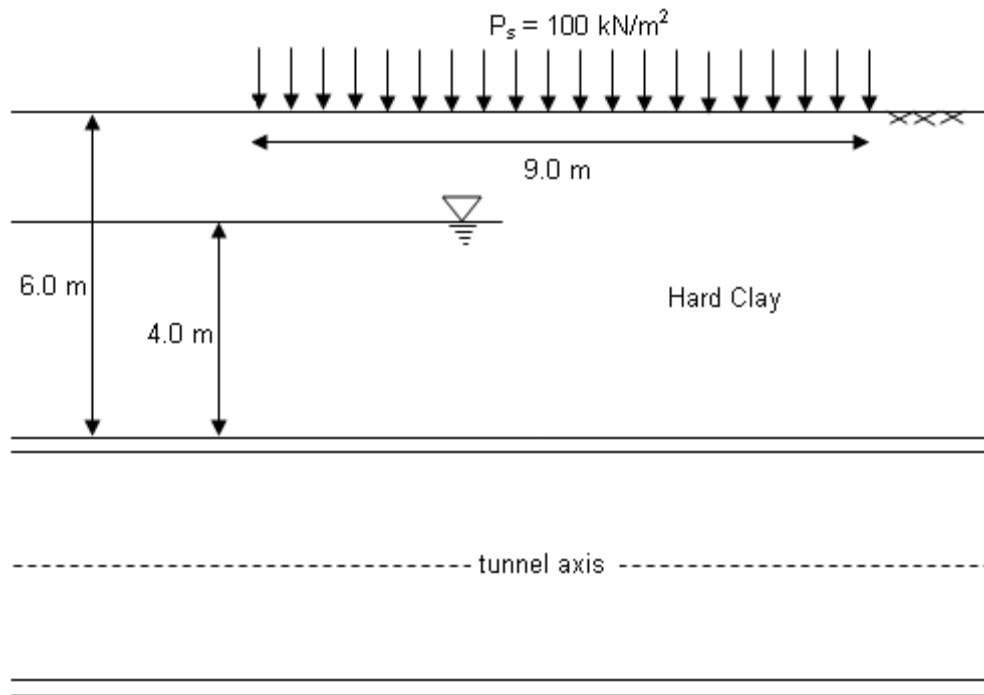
Longitudinal profile of the tunnel under surcharge pressure
